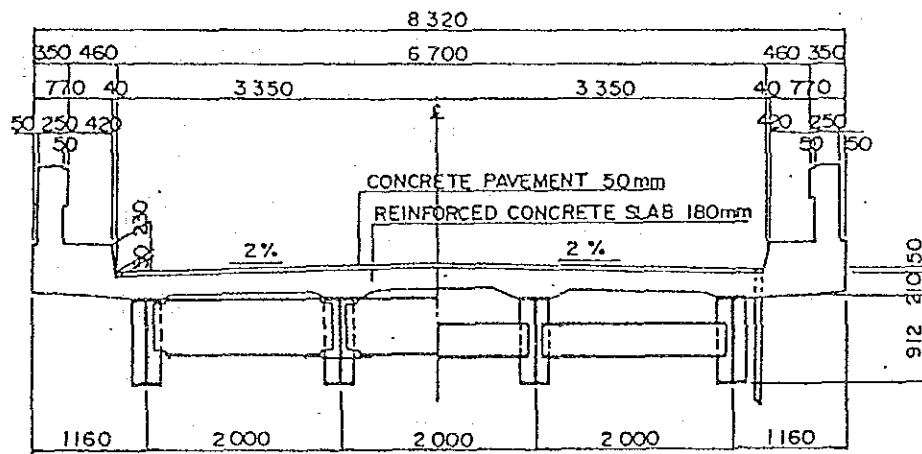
TYPICAL GENERAL VIEW OF BRIDGE
